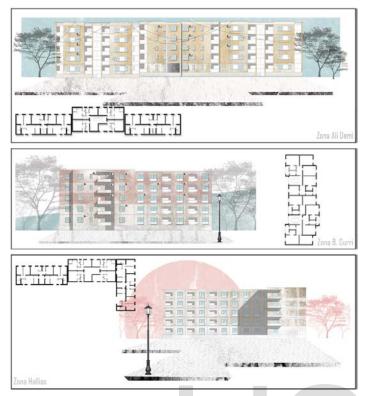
Presentation of the plants and facades of some prefabricated buildings composed of different planimetric modules, in the city of Tirana © B. Tataveshi.
